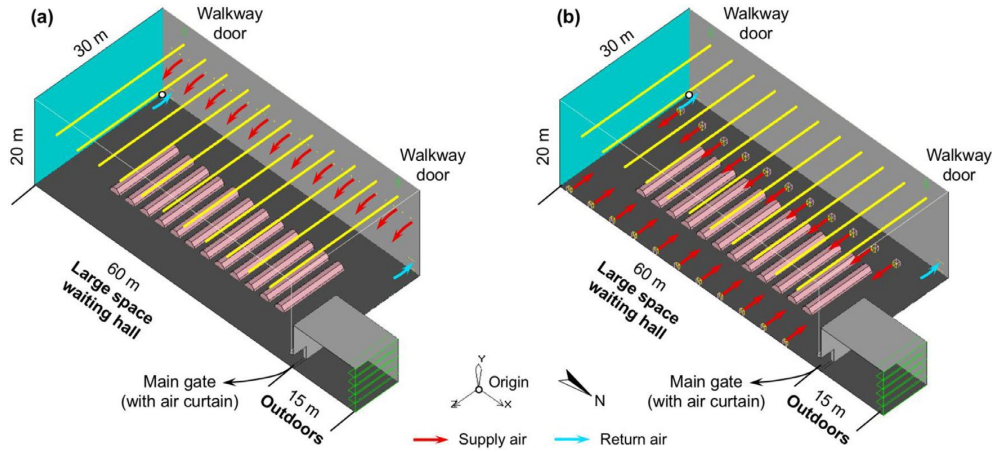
Model of the simplified building: (a) mixing ventilation subtype (MV) and (b) displacement ventilation/radiant floor subtype (DV or RF + DV) (Source: X. Liu et al., 2020)
